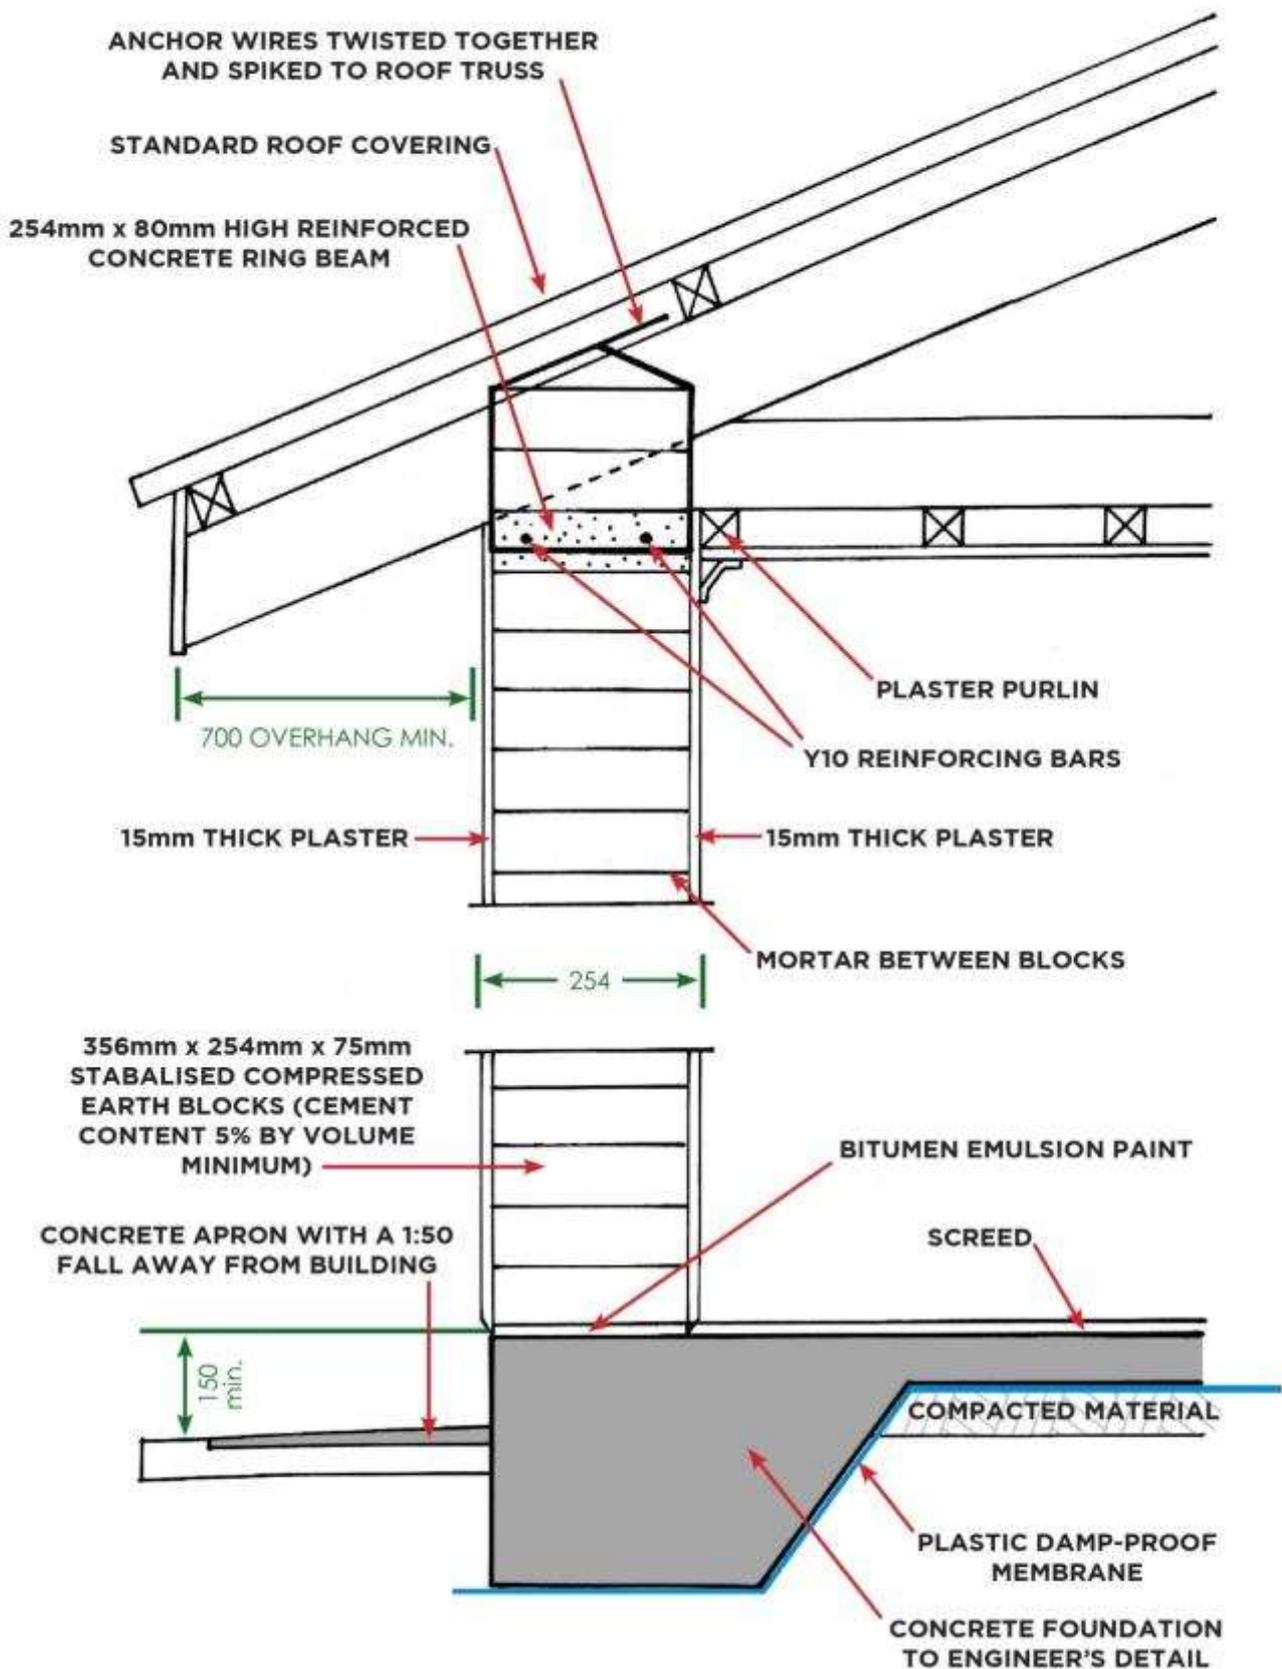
WEATHERPROOFING A COMPRESSED EARTH BLOCK HOUSE (ADAPTED FROM USE-IT AGREEMENT CERTIFICATE 2011/397: COMPRESSED EARTH BLOCKS BUILDING SYSTEM)
